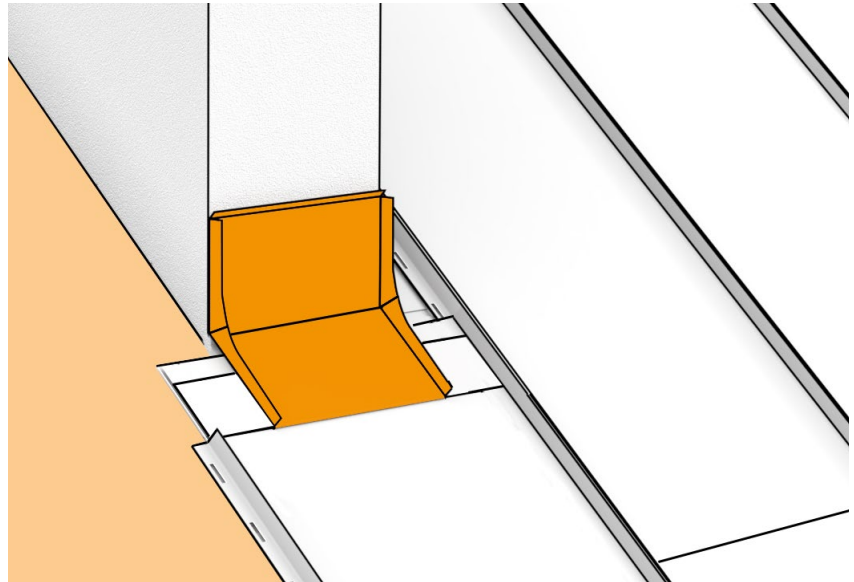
CONNECTING THE FLASHING TO THE REBATE
